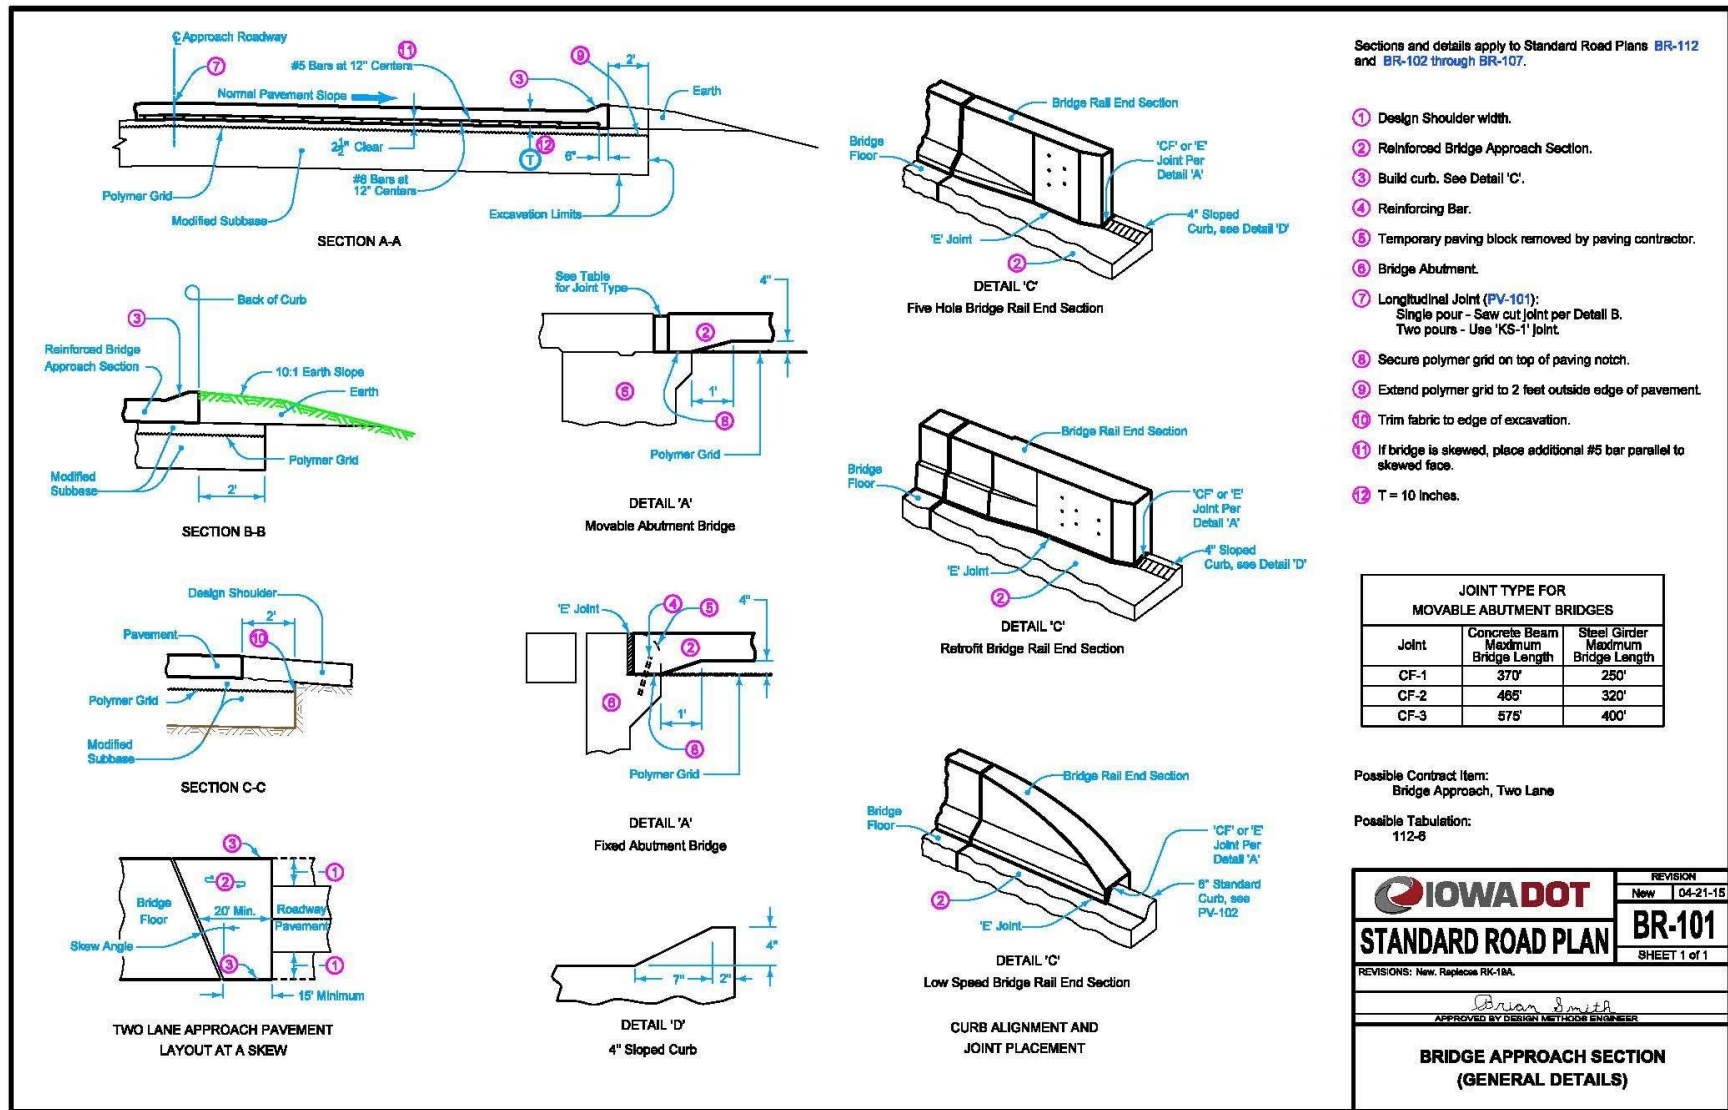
Iowa DOT Standard Road Plan BR-101 – Bridge Approach Section (General Details) [68]
